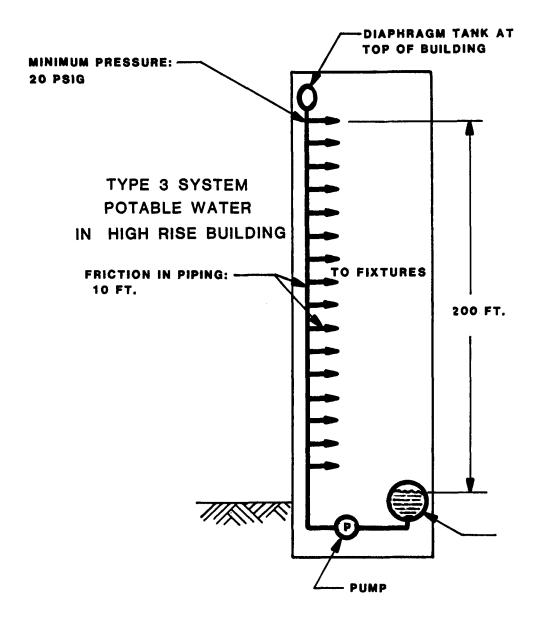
Type 3 System (Potable Water in High Rise Building).
